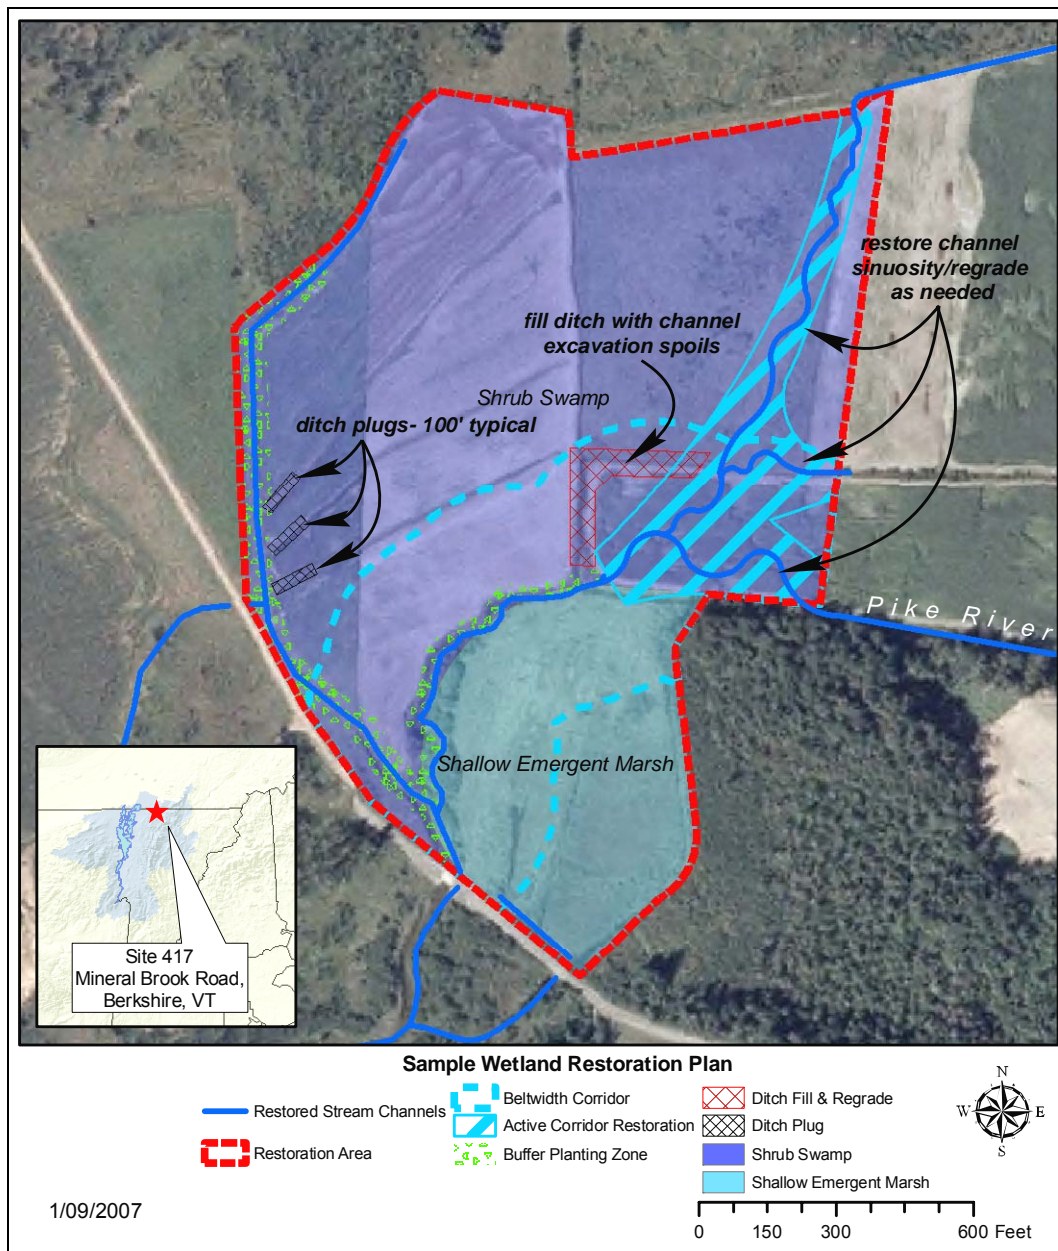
Site 417, Sample Shrub Swamp Wetland Restoration Plan
